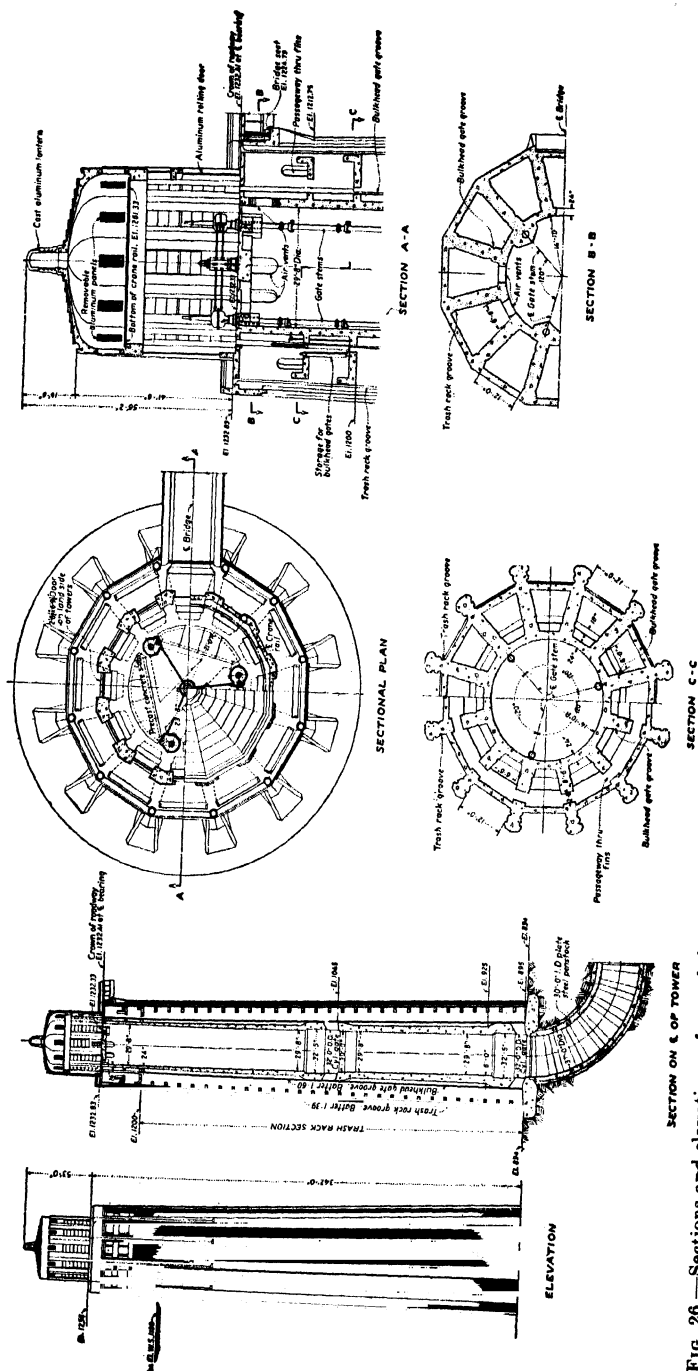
Sections and elevations of one of the four similar intake towers at Hoover Dam. All water released from behind the dam must pass through one or more of these intakes.
